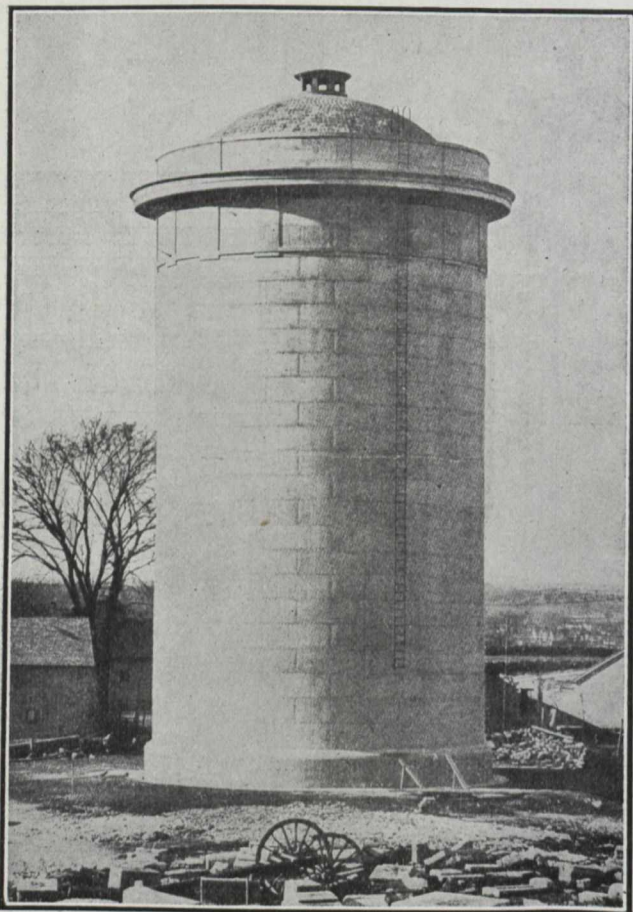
Reinforced Concrete Stand-Pipe at Westerly, R.I.
